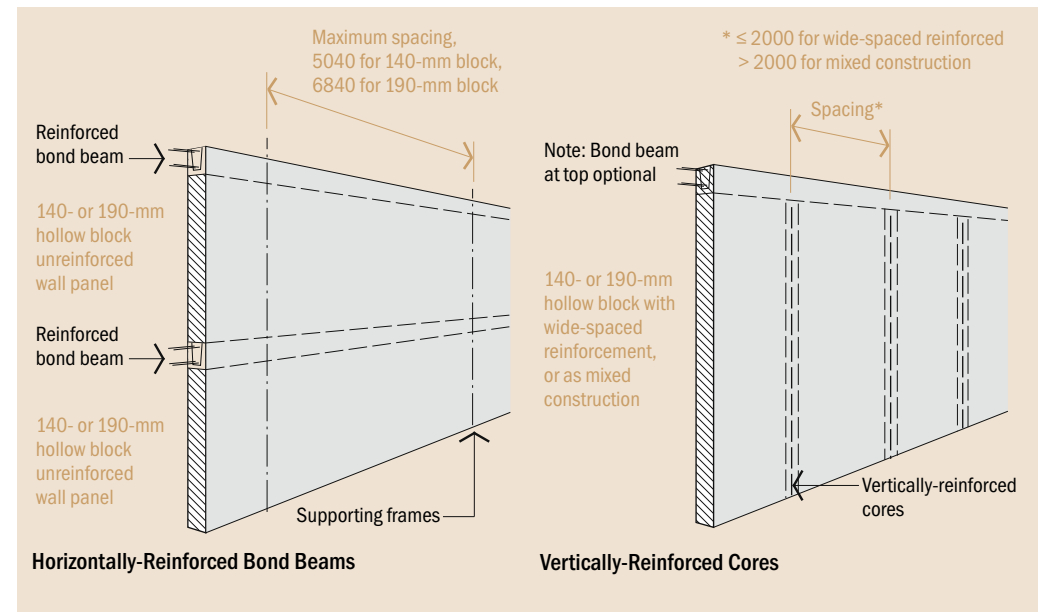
Reinforced and Mixed Construction Arrangements for Concrete Masonry Walls
